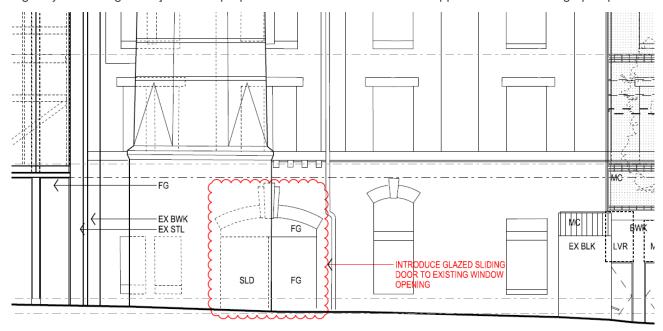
Location of the proposed glazed sliding door to replace existing, approved window opening. Source: Tzannes, "Northern Elevation", Revision F, 15/3/2022.
